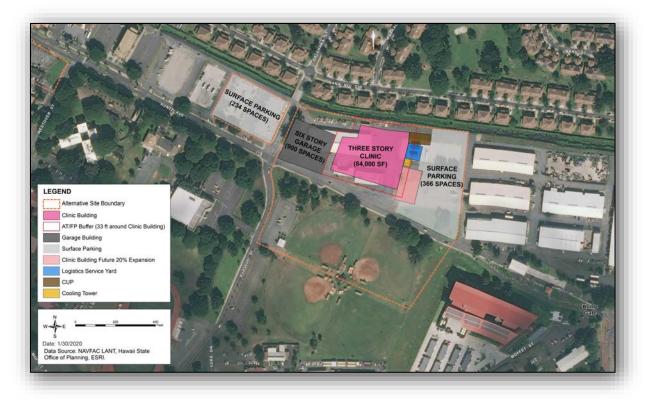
Proposed Facility Layout at the Kuntz Gate Site
